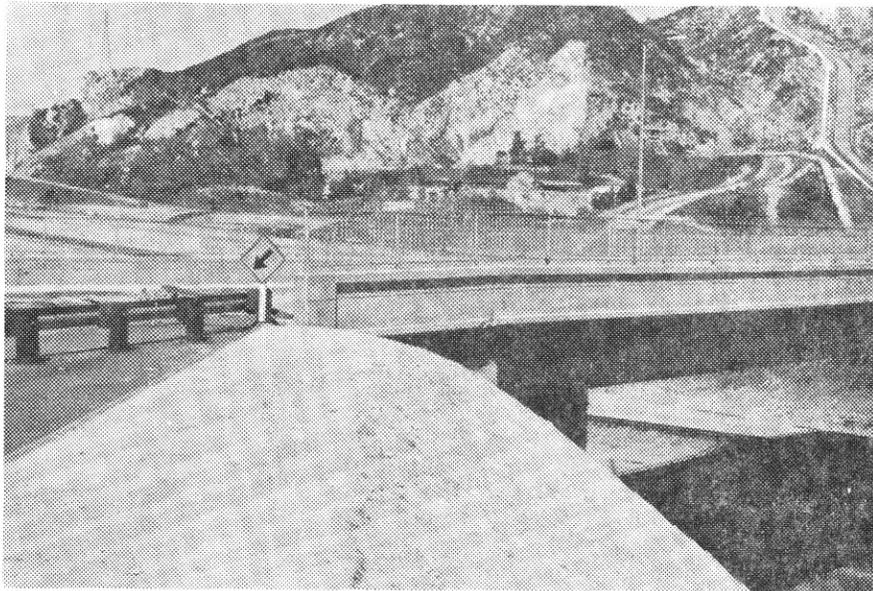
Looking northeasterly at westerly abutment of Balboa Boulevard Overcrossing. Note slight arch in structure caused by abutment movement.
